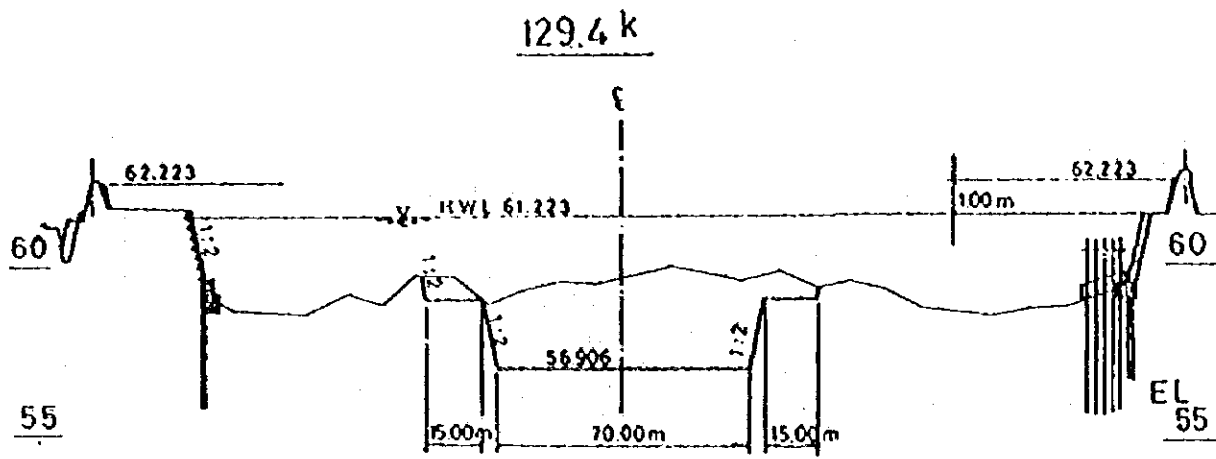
(2) TYPICAL DESIGN CROSS SECTION
